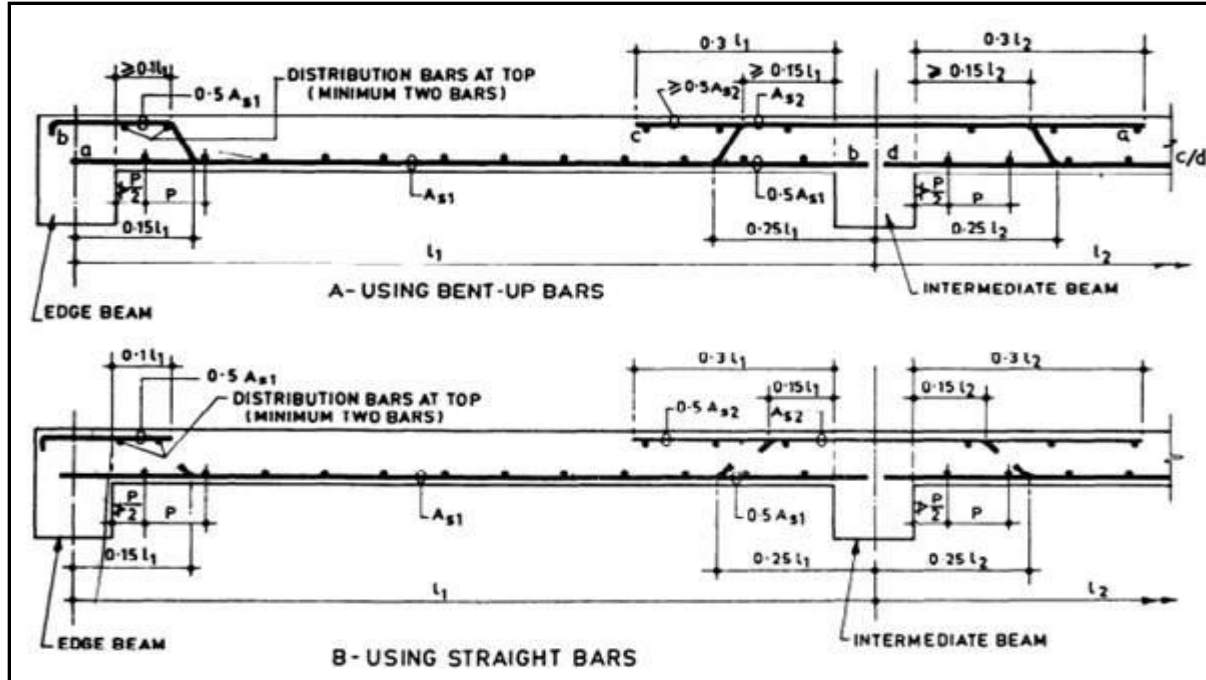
TYPICAL REINFORCEMENT FOR DECK SLAB OF BRIDGE
